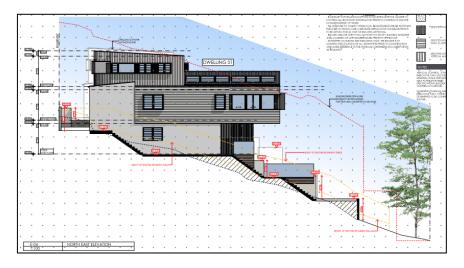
Extract from plans DA-304 – Elevations - Dwelling 1 (Source: Plans, Shade)
